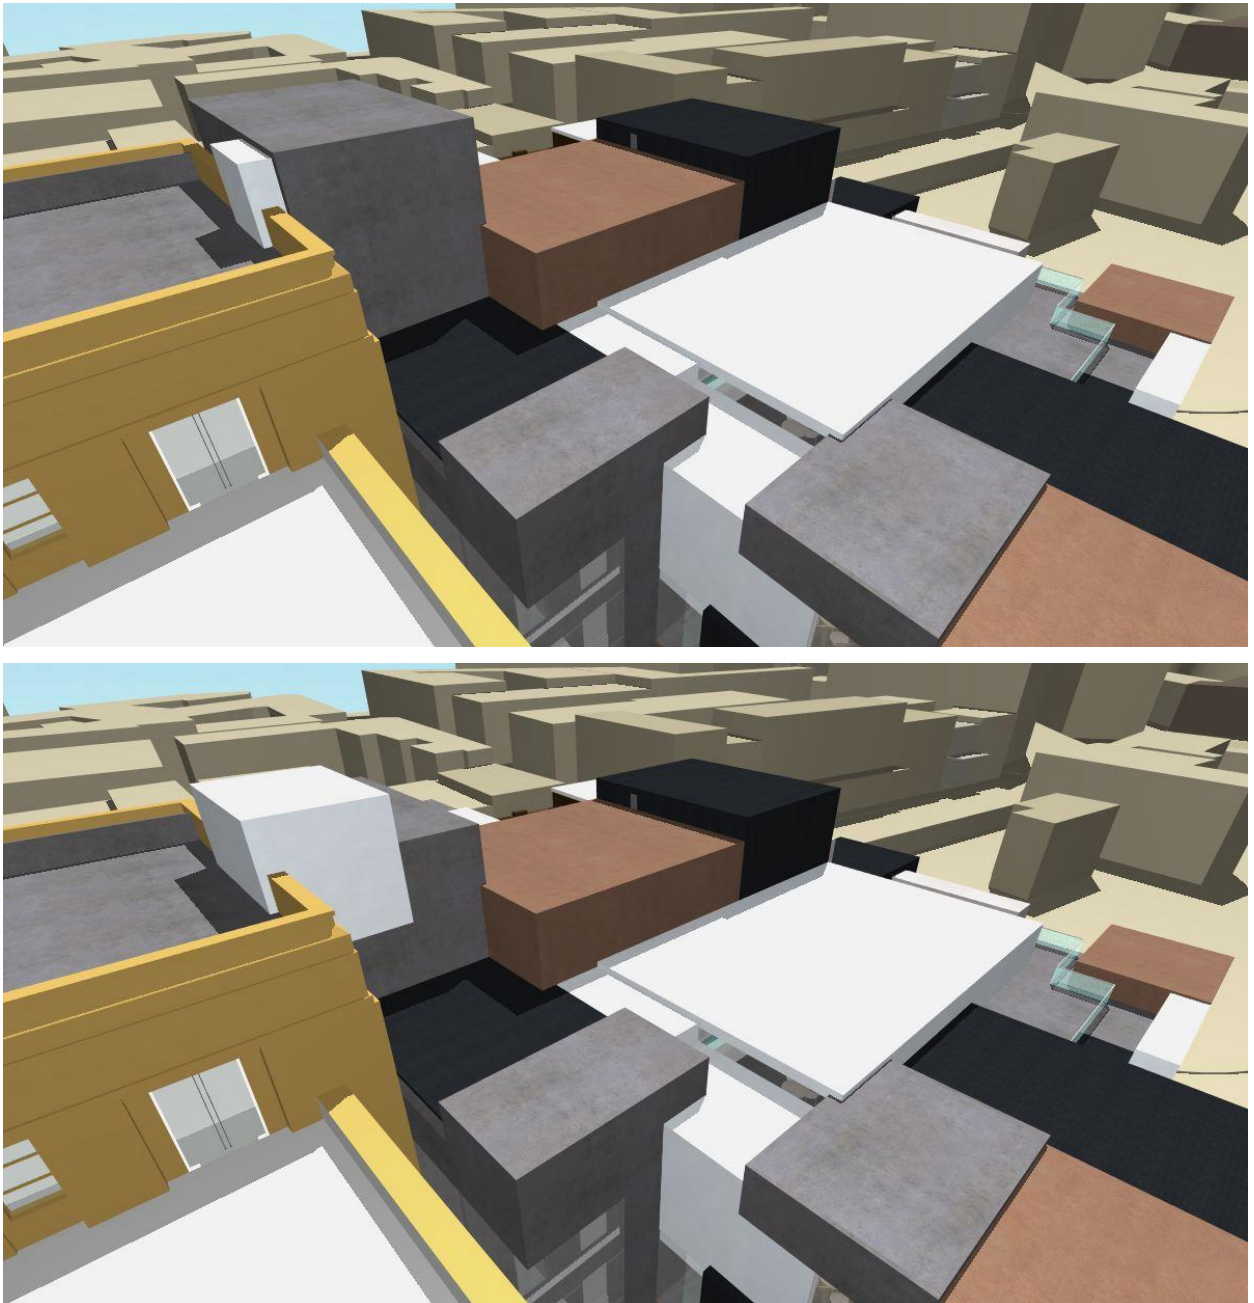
Level 6 stair as originally proposed and as amended, looking west
